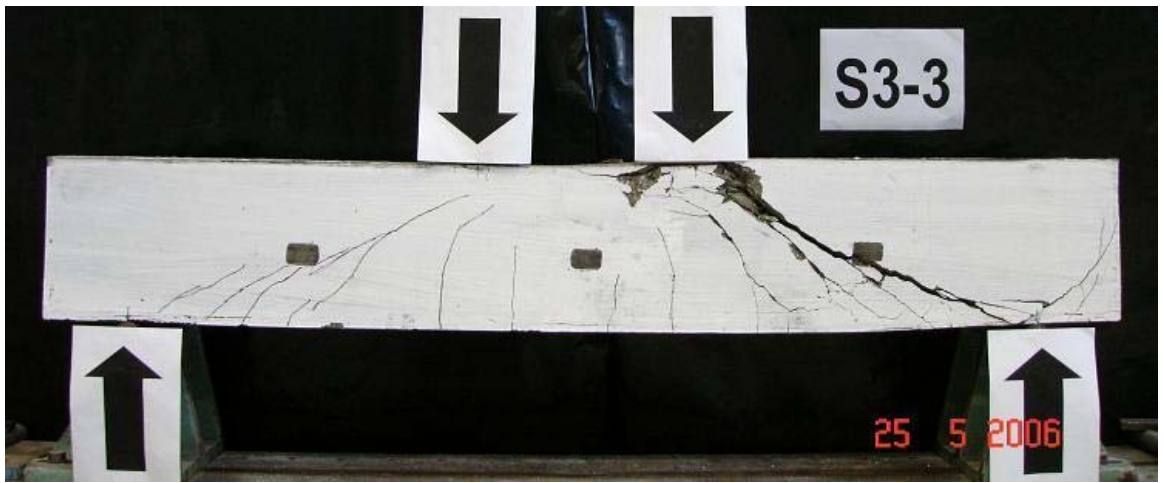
Overall Crack Pattern for Beam 3-3 (Front Face)
